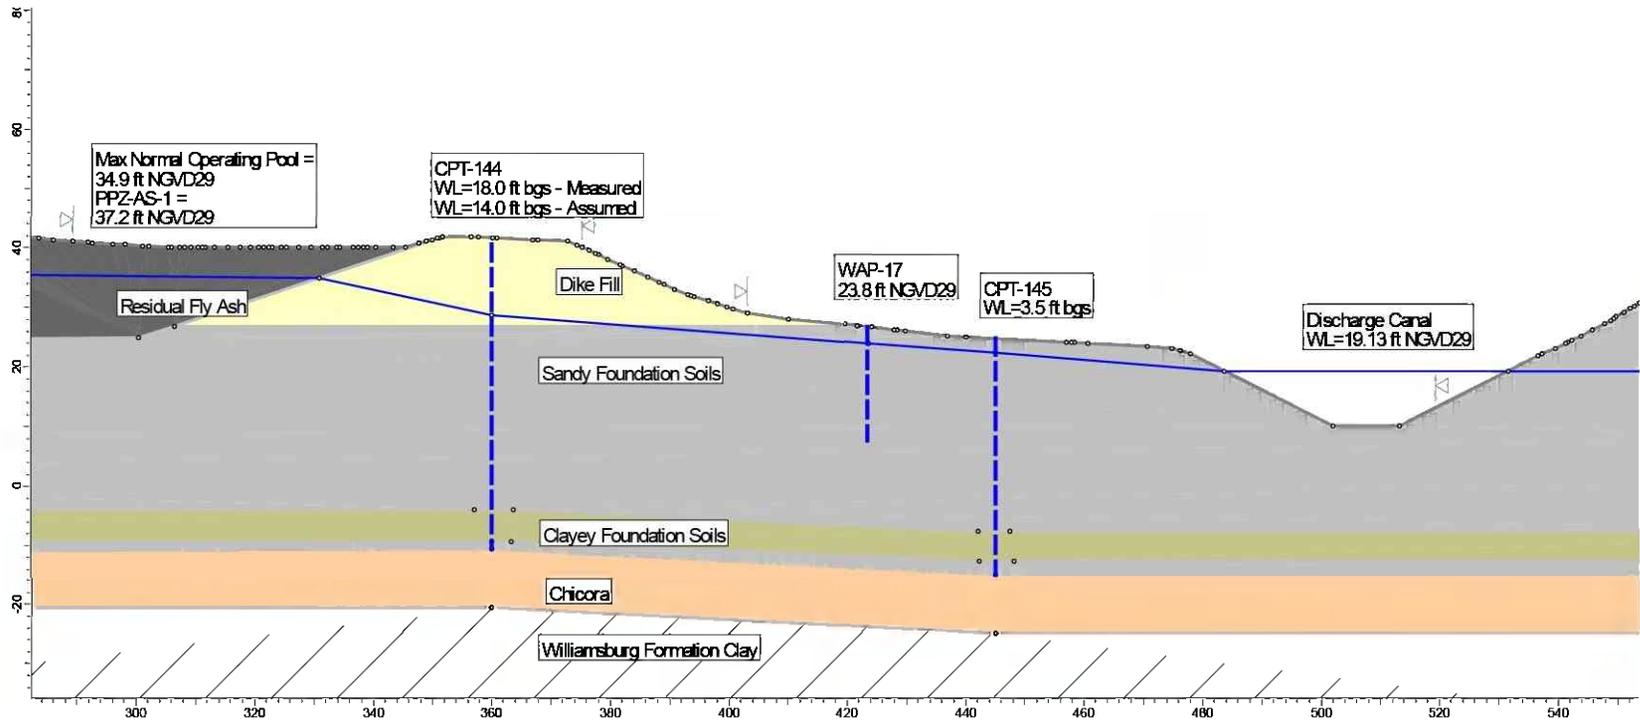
Cross Section A Geometry during Maximum Normal Storage Pool Conditions
